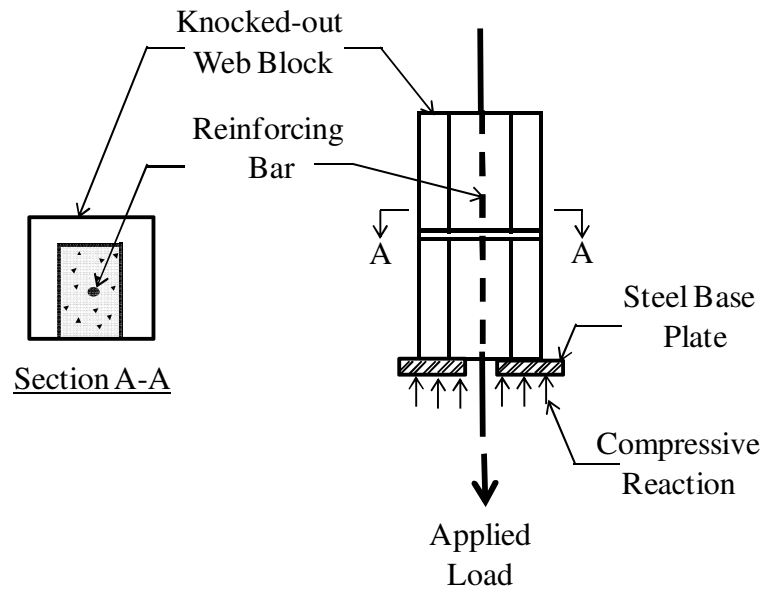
Baynit's pullout specimens (modified from Baynit, 1980).
